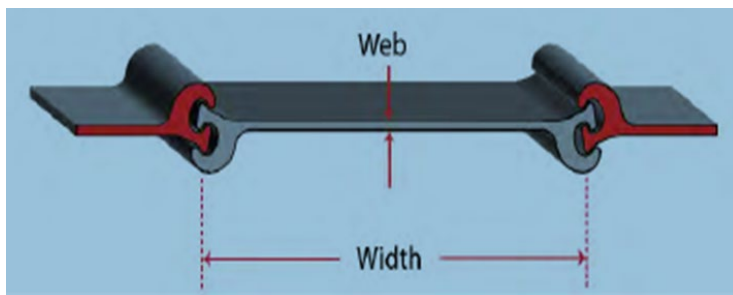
Typical Sheet Pile in the North Extension Bulkhead and Tailwalls with Thumb and Finger Interlock
